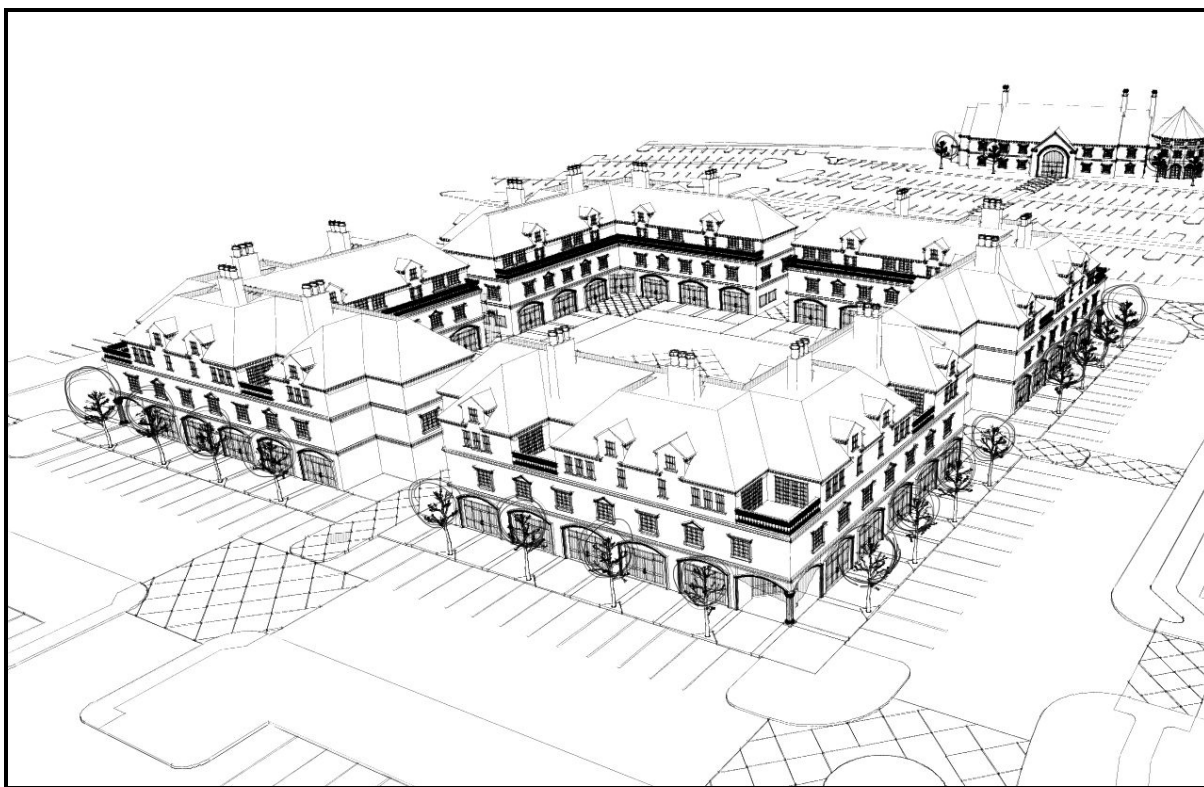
3-D rendering of central Square 3-story mixed-use building.
